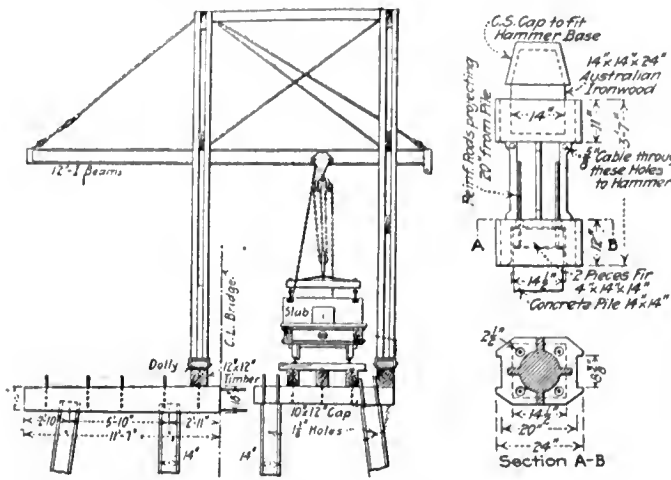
Gantry for placing slabs and cap for driving piles.
